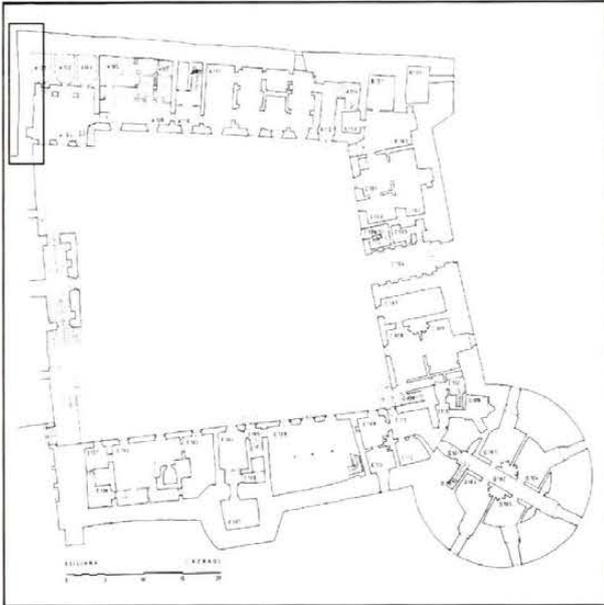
The northwest wall of the east outer bailey of Turku Castle.
